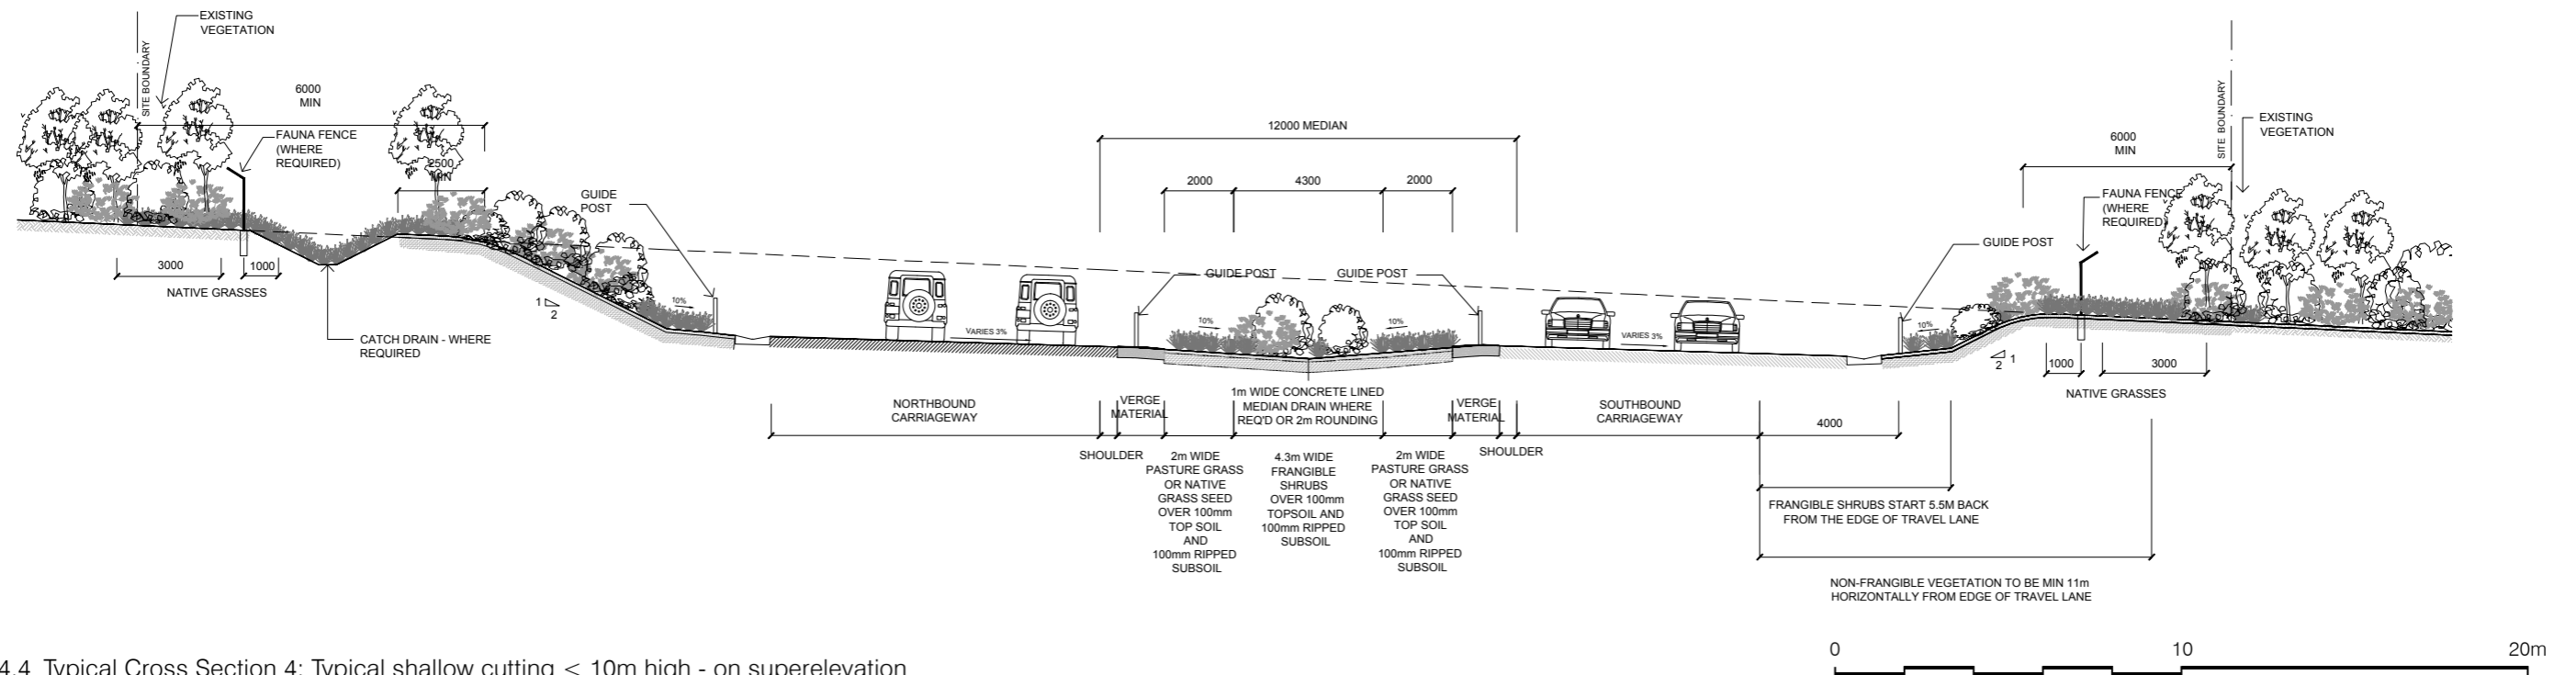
Typical Cross Section 4: Typical shallow cutting < 10m high - on superelevation
